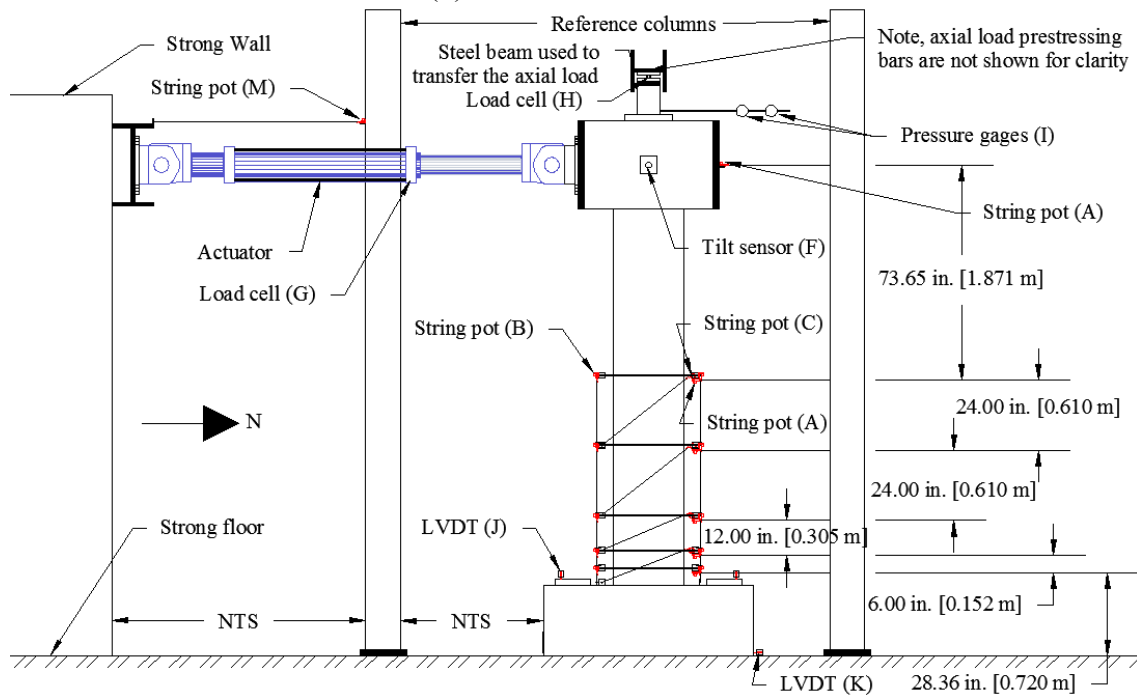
Elevation view of column C1, C2, C3 and C4 external instrumentation (NTS = not to scale)
